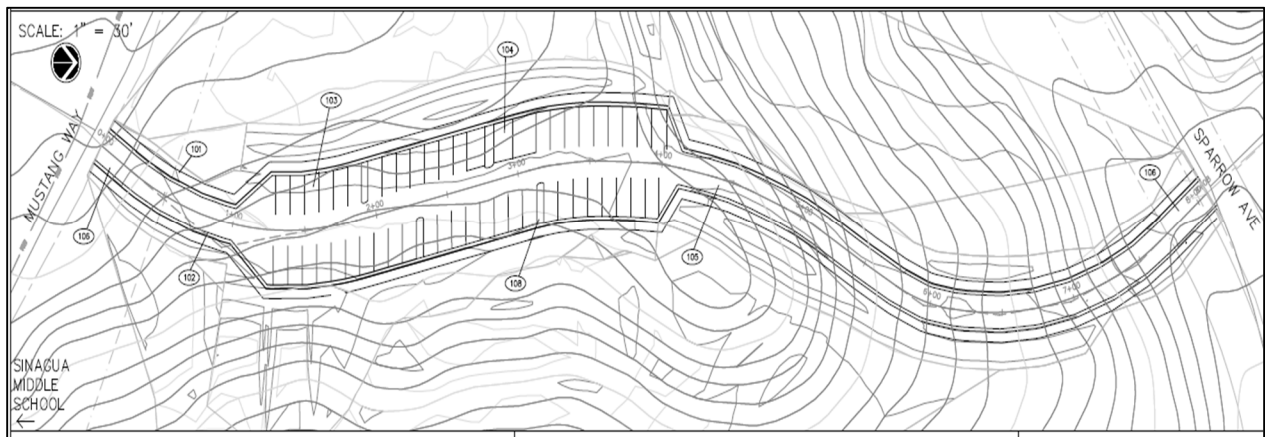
Road Layout and Design for Habitat for Humanity Preliminary Site Design (NTS)
